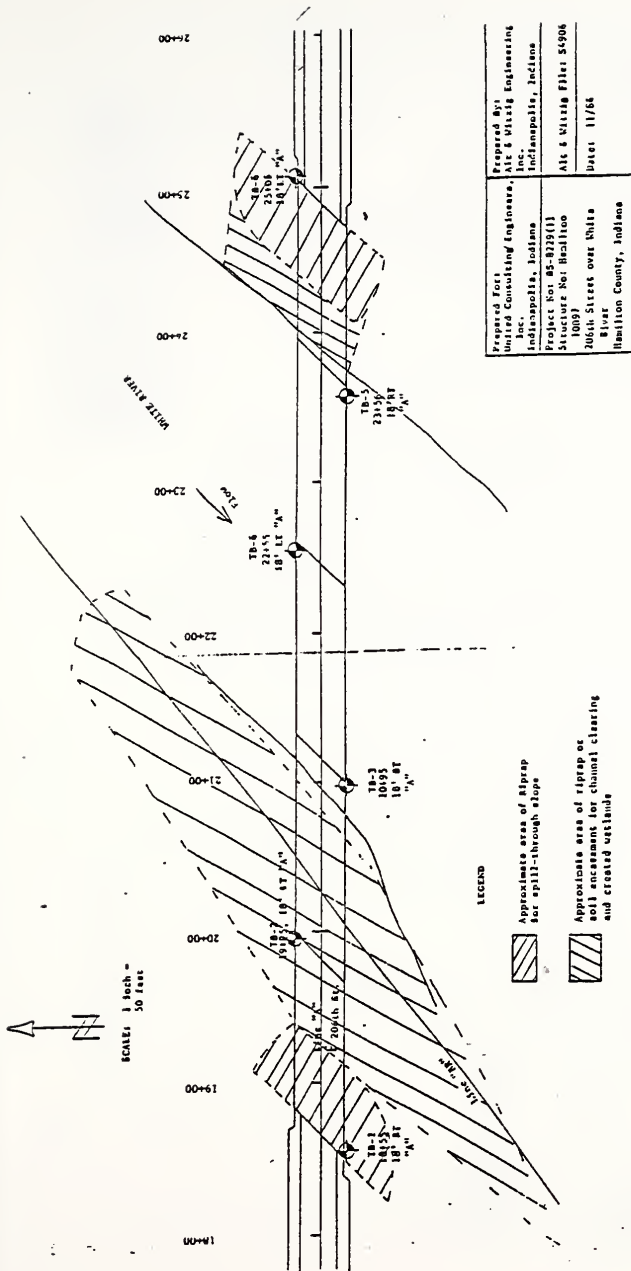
Plan layout of the six test borings (TB-1 to TB-6) used to obtain the soil profiles for the East 206th street bridge over White river
